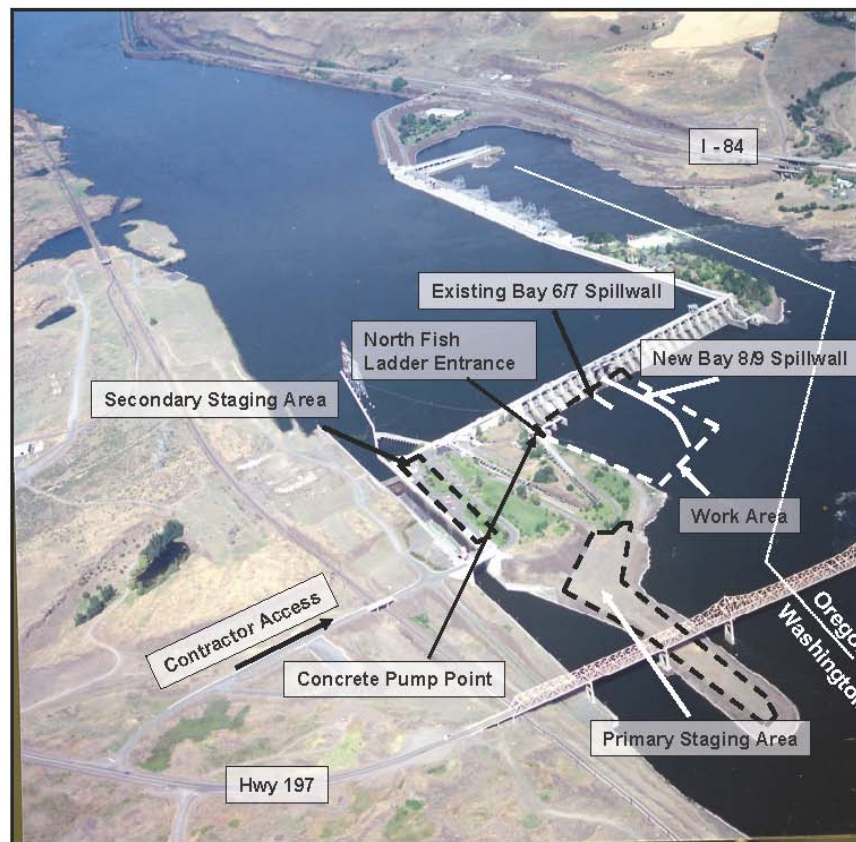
Aerial view of The Dalles Dam showing the location of the proposed spillwall and construction staging areas.
